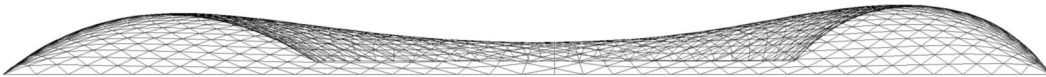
Elevation of structural grid looking west (Williams, 2001)
